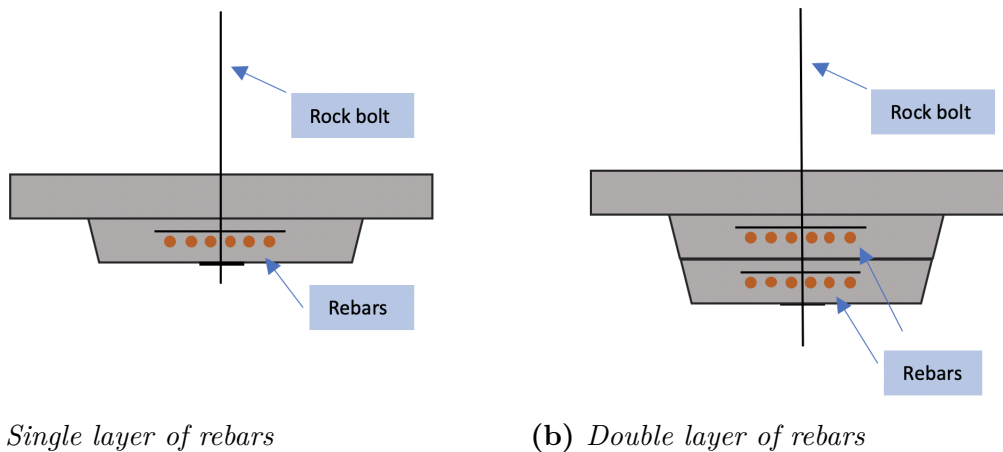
The graphs a and b shows a schematic cross section of reinforced shotcrete arches with single or double layer of rebars (author's own work).
